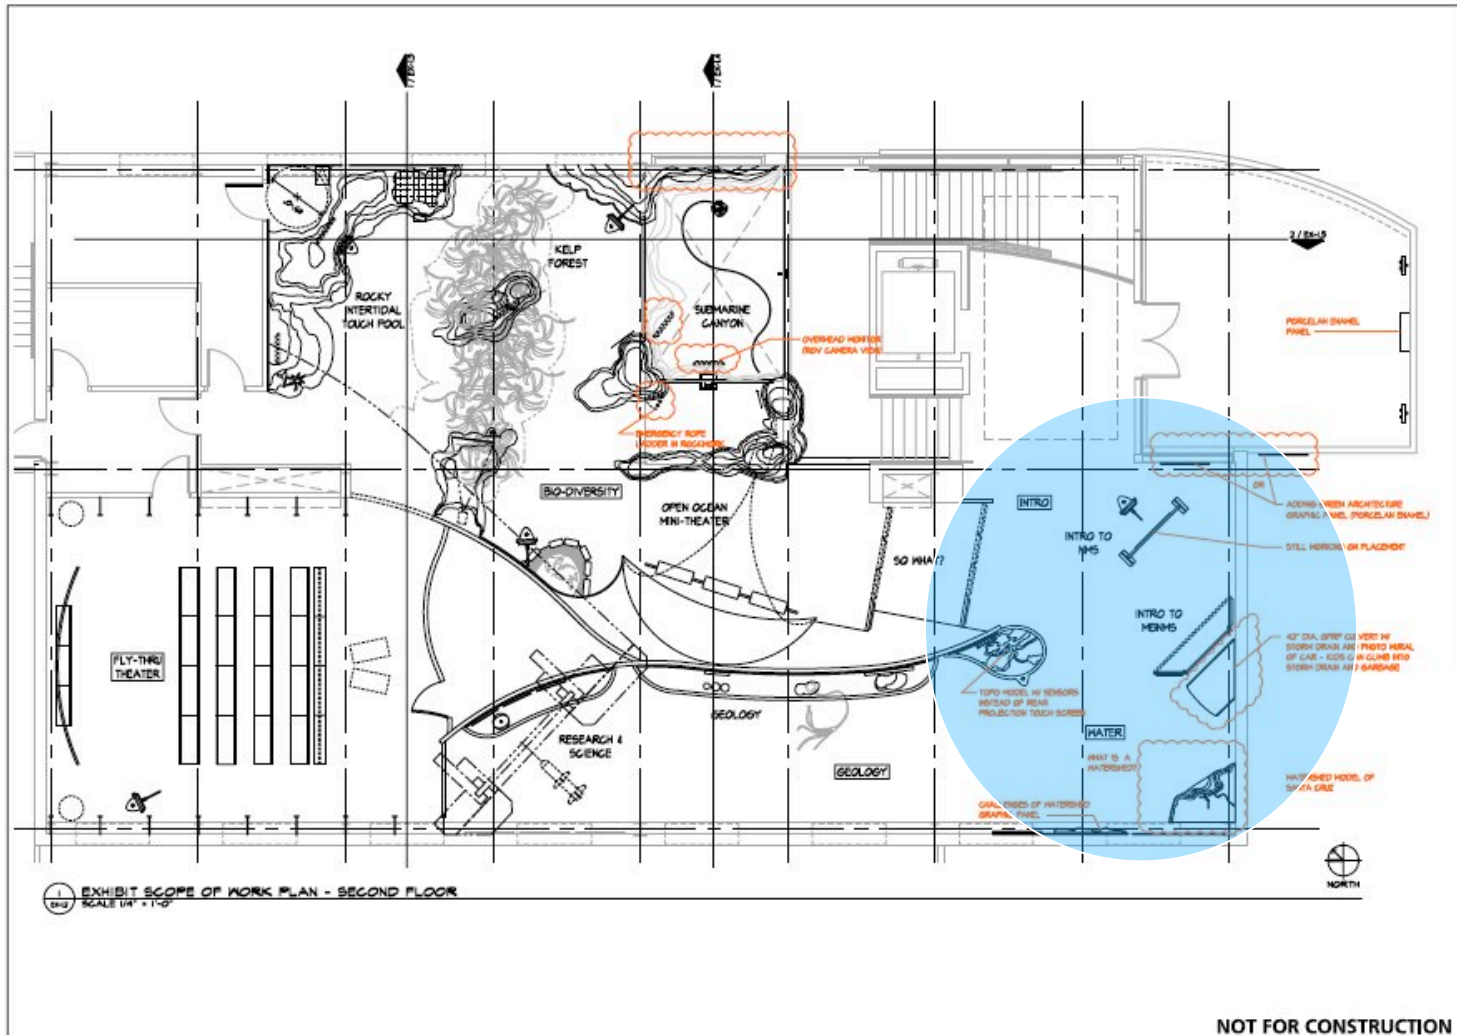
EXHIBIT SCOPE OF WORK PLAN - SECOND FLOOR
